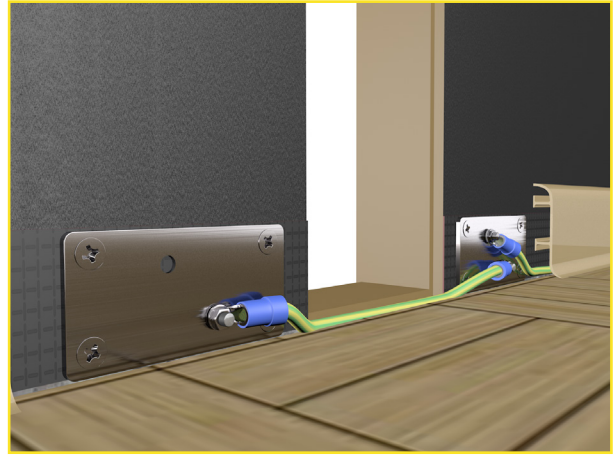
Connecting room openings with floor bonding technique or by means of 2 grounding plates
